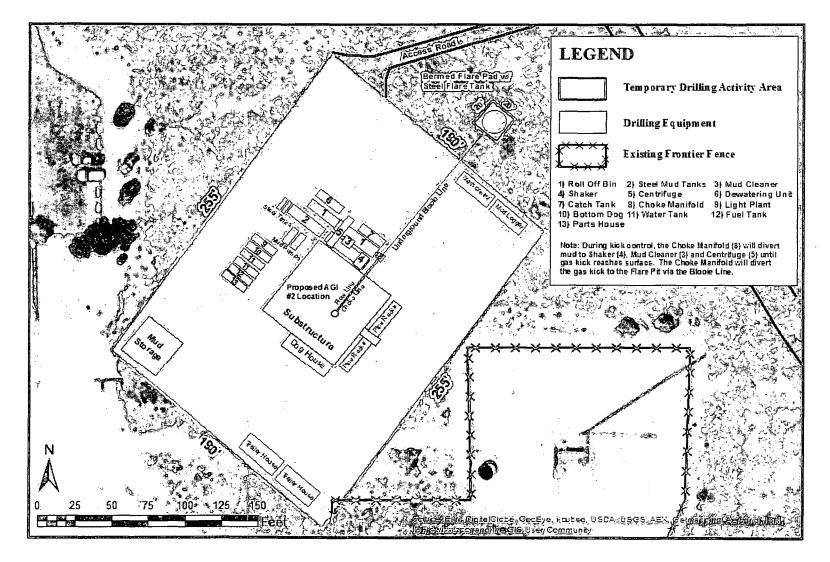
Proposed Well Site Layout, Maljamar AGI #2
